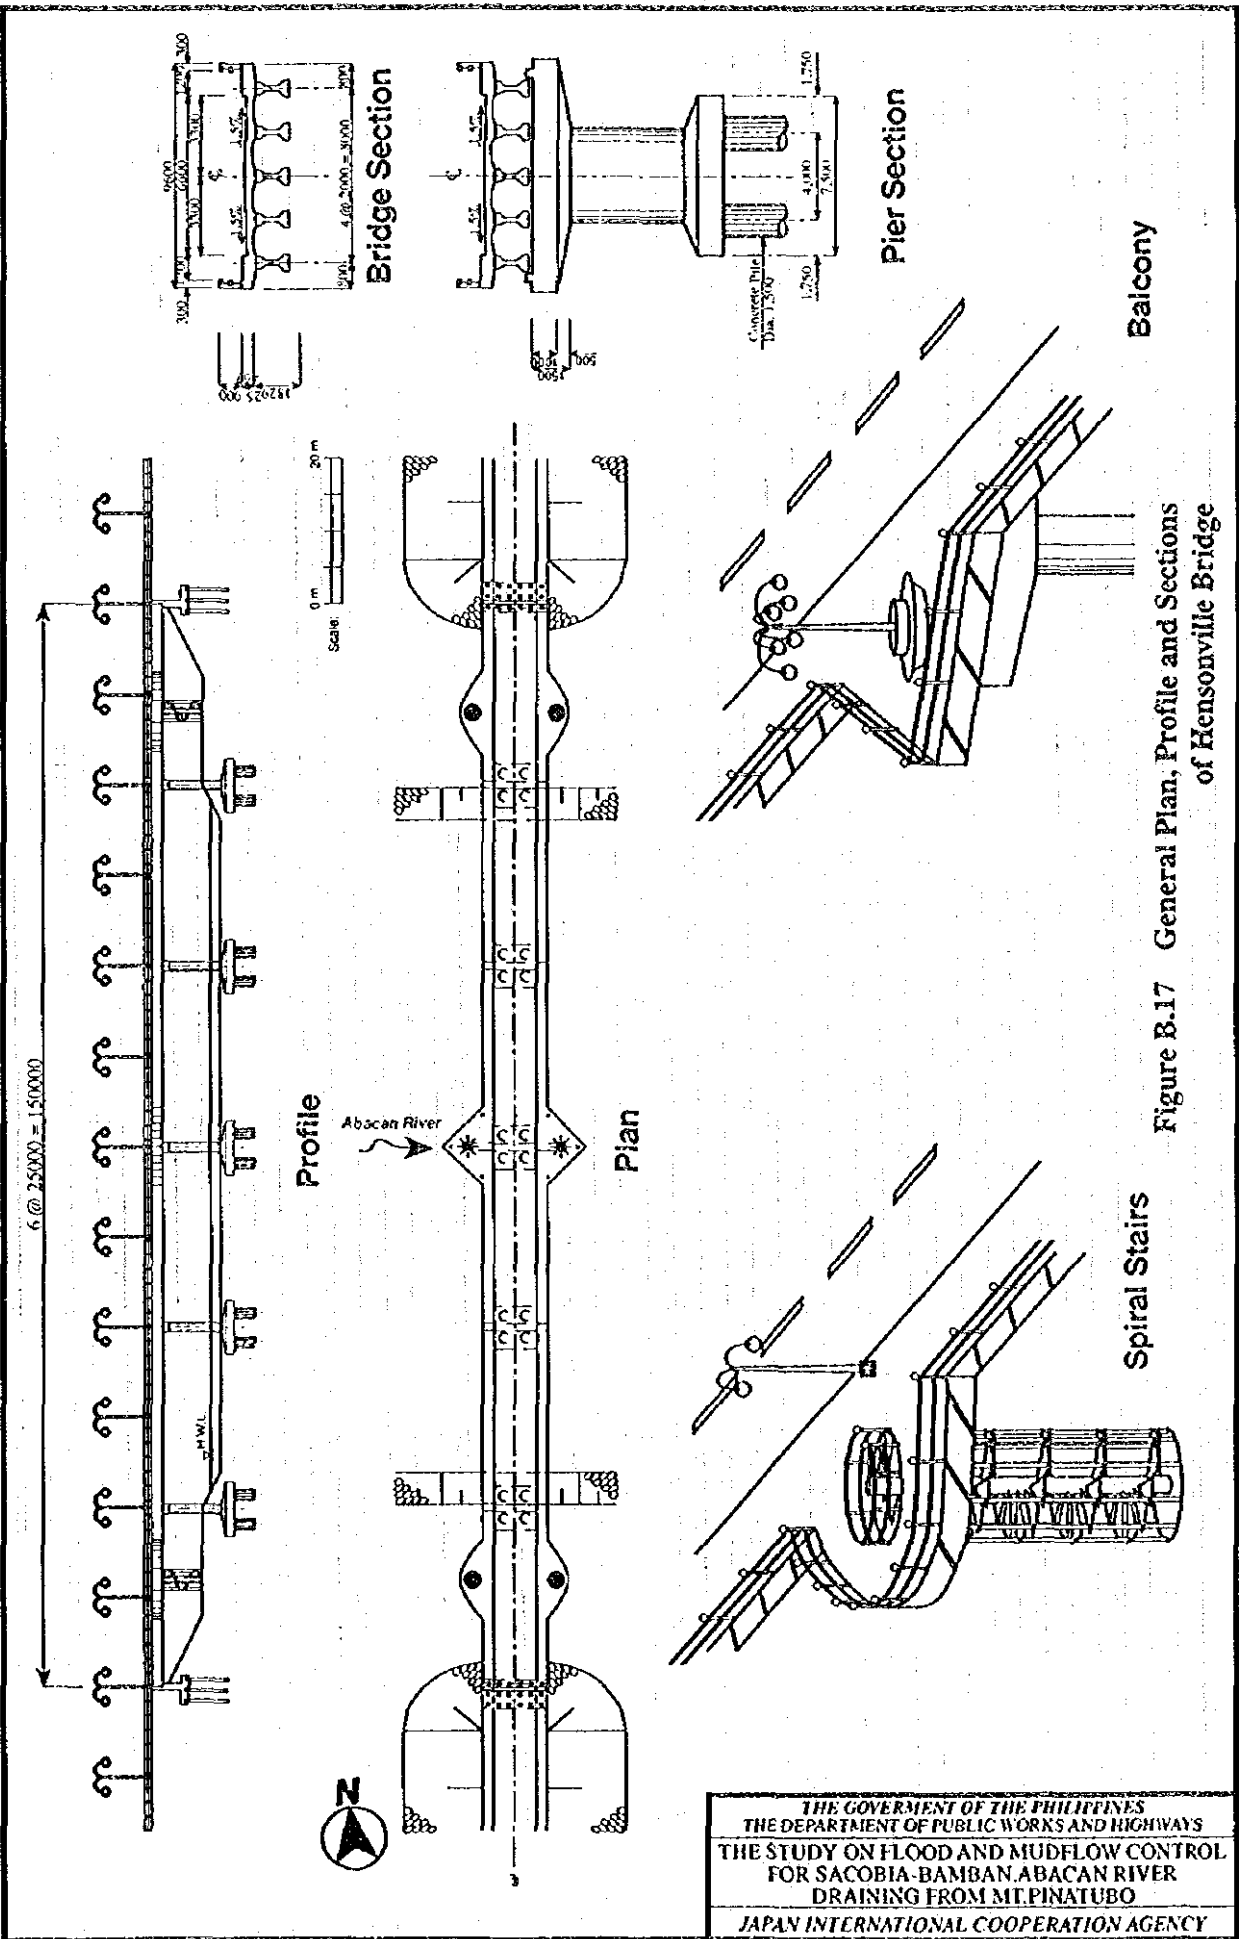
General Plan, Profile and Sections of Kenosville Bridge
